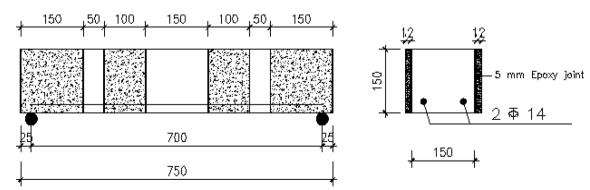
Beam strengthened with vertical HPFRC strips (all dimensions in mm)
